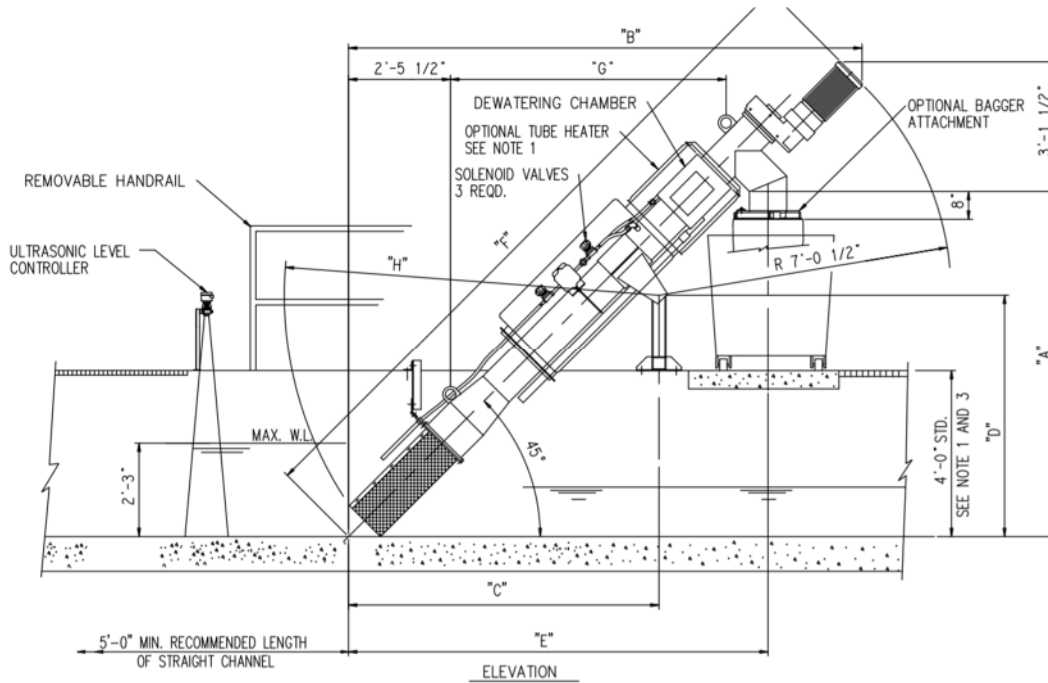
Cylindrical Bar Screen with Integral Conveyor (courtesy Lakeside Equipment Corp.)
